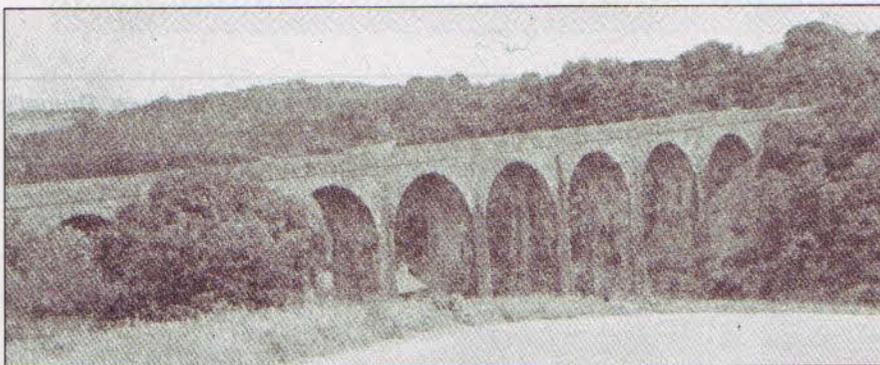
/12 In practice most curved viaducts are made up from a succession of short straight spans built on tapered piers. This type of construction is essential where girders are concerned, and greatly simplifies the construction of masonry arches.
